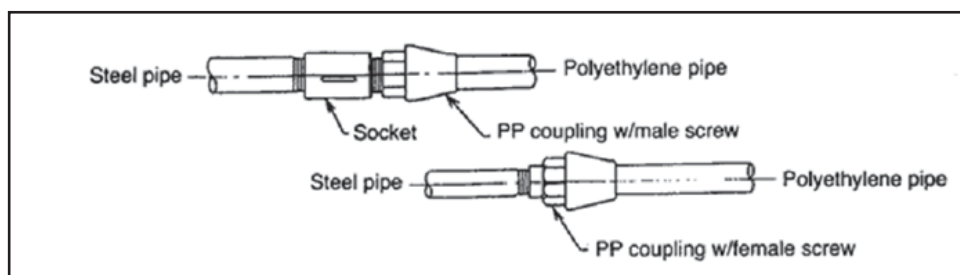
Connection between Steel pipe and Polyethylene pipe
